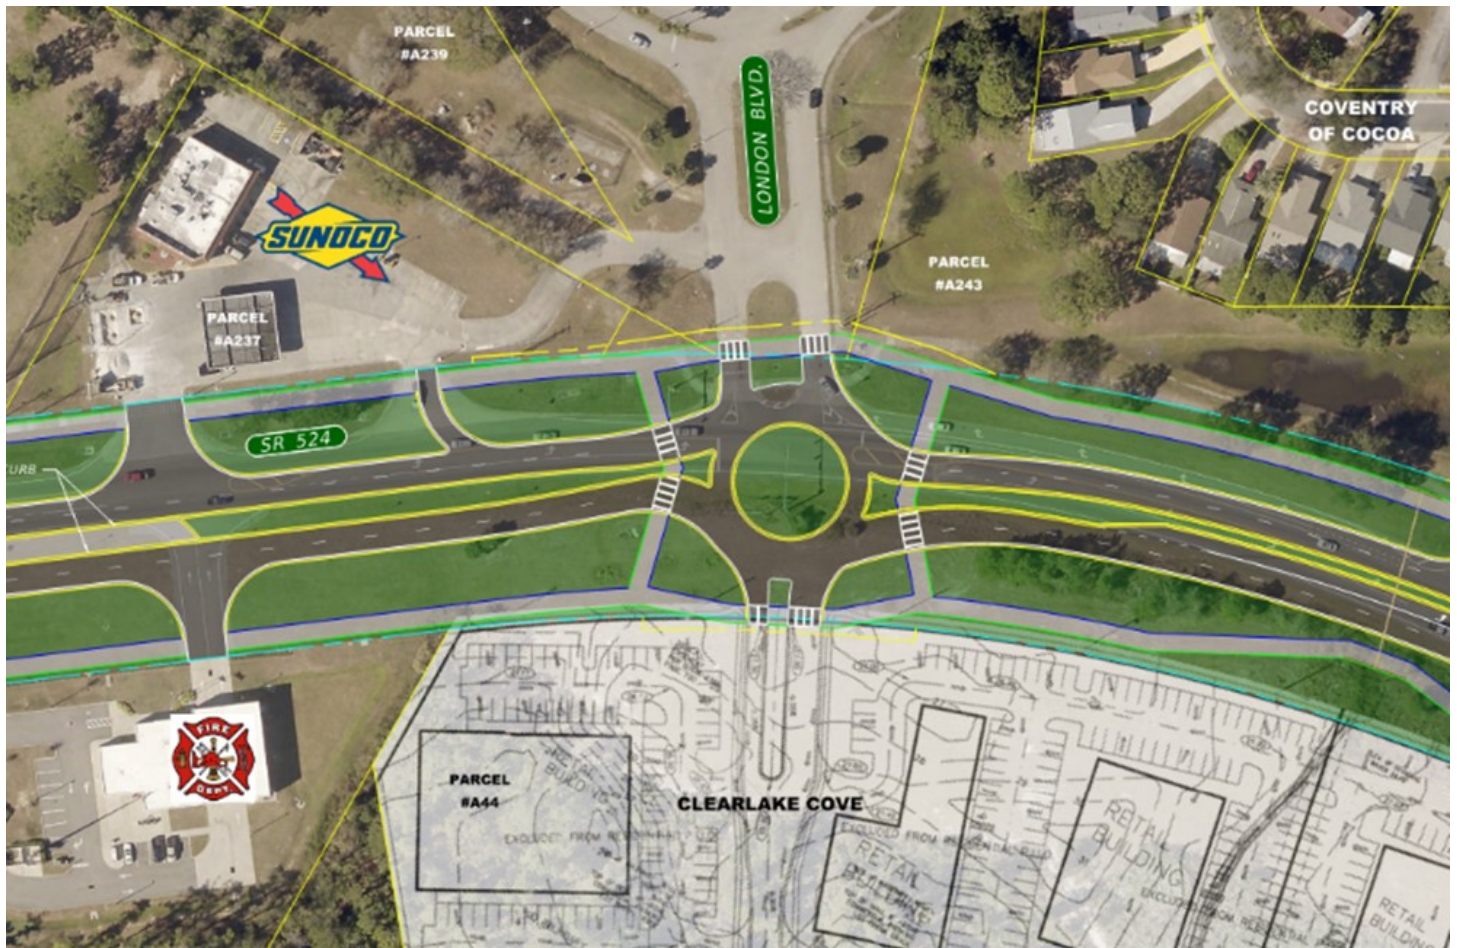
Preferred Alternative Roundabout at London Boulevard
